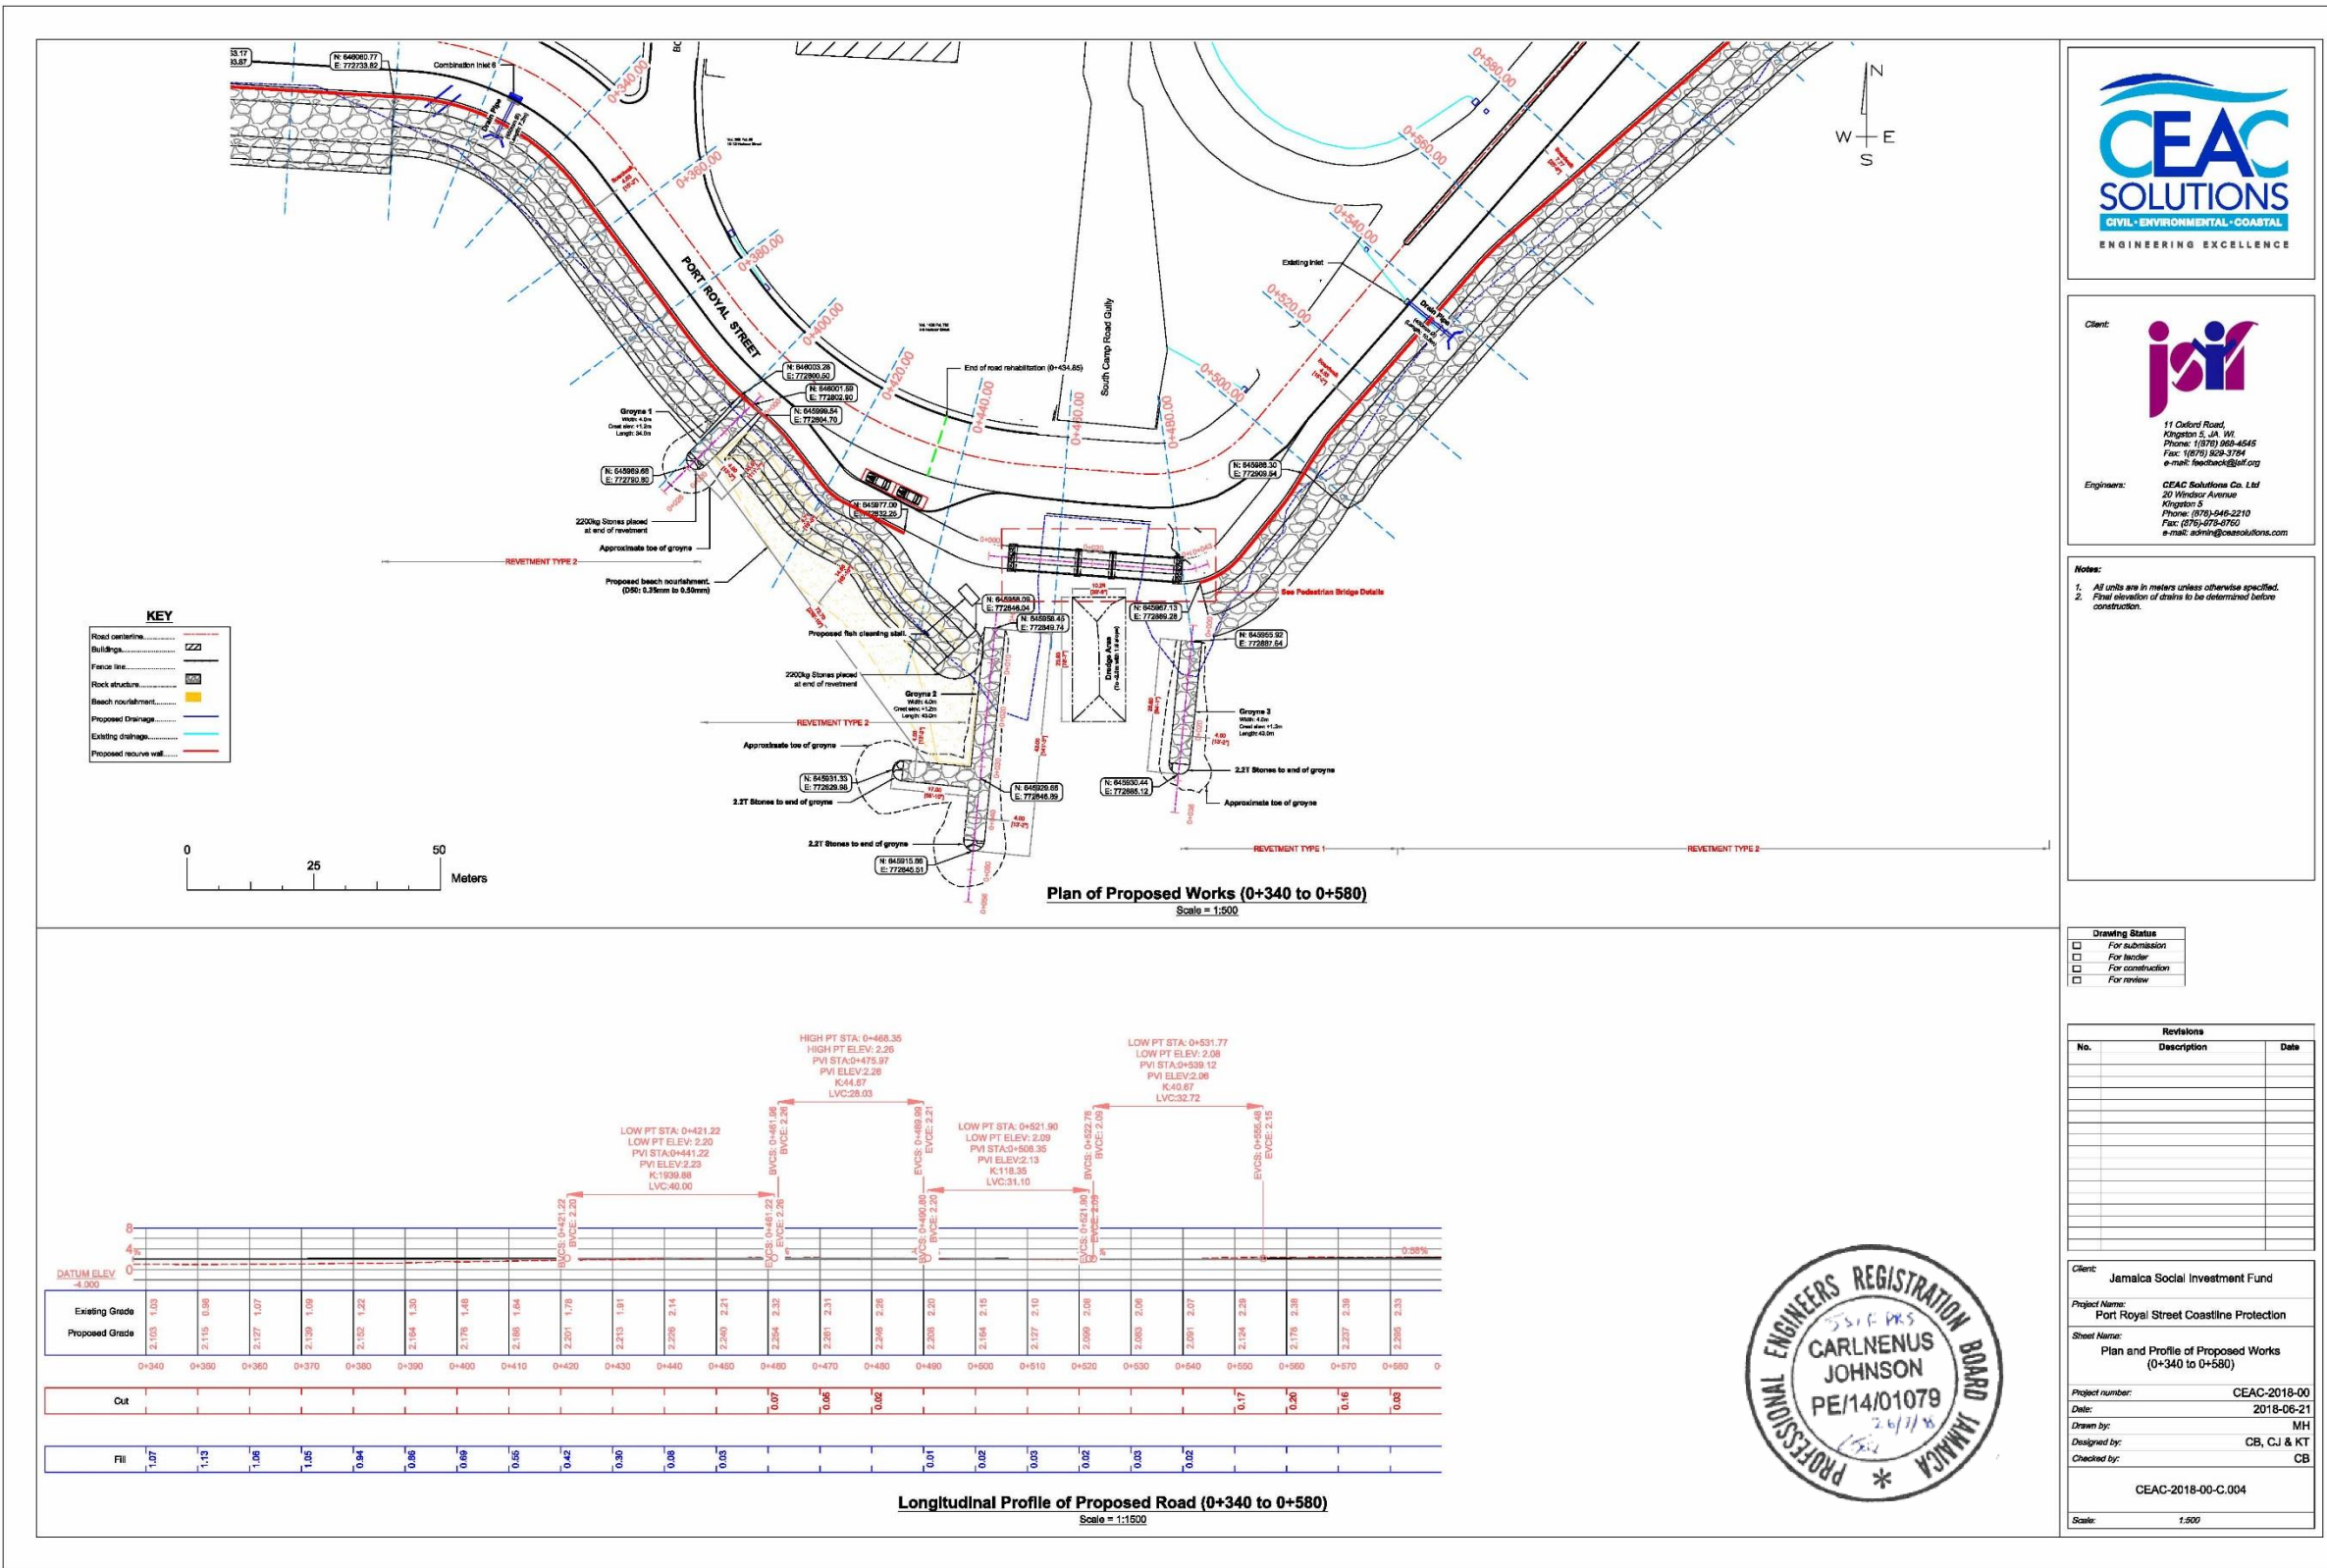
Plan and Profile of Proposed Works (0+340 to 0+580)
